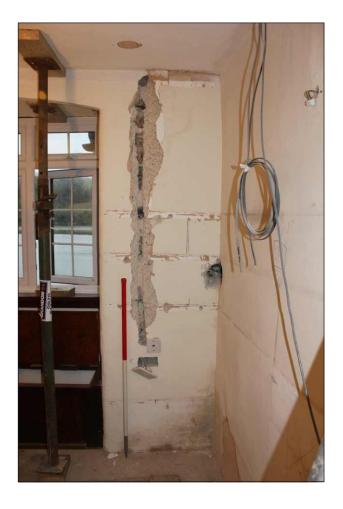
The interior face of the east elevation of the mill house prior to removal of finishes, looking northeast (1m scale)
